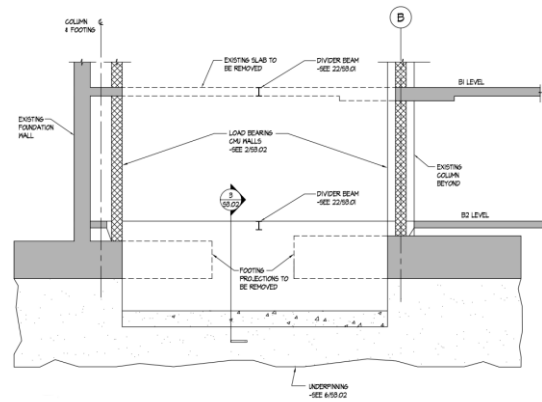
Section showing demo of slab and footing projects with underpinning locations, 4/S3.02
